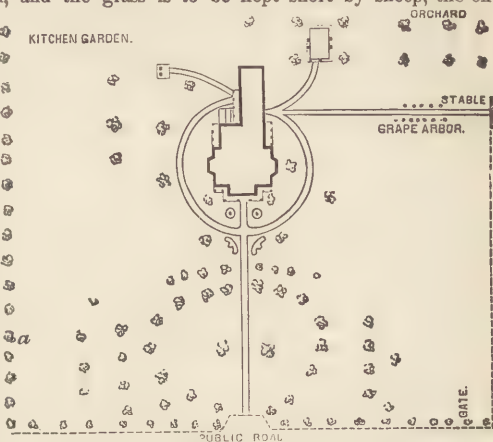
STIFF AND UNIMPROVED PLAN OF GROUNDS.
